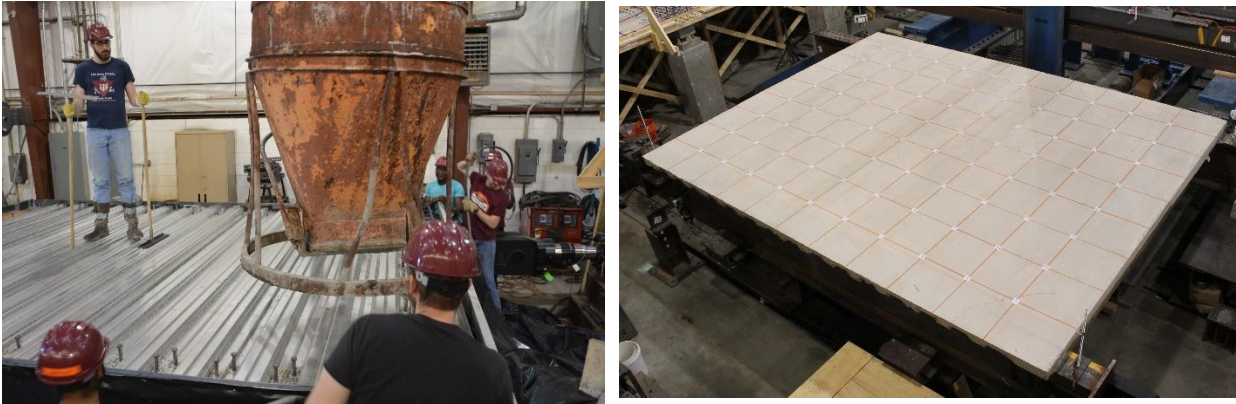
Specimen 2/4-4-L-NF-DT Before and After Concrete Placement
